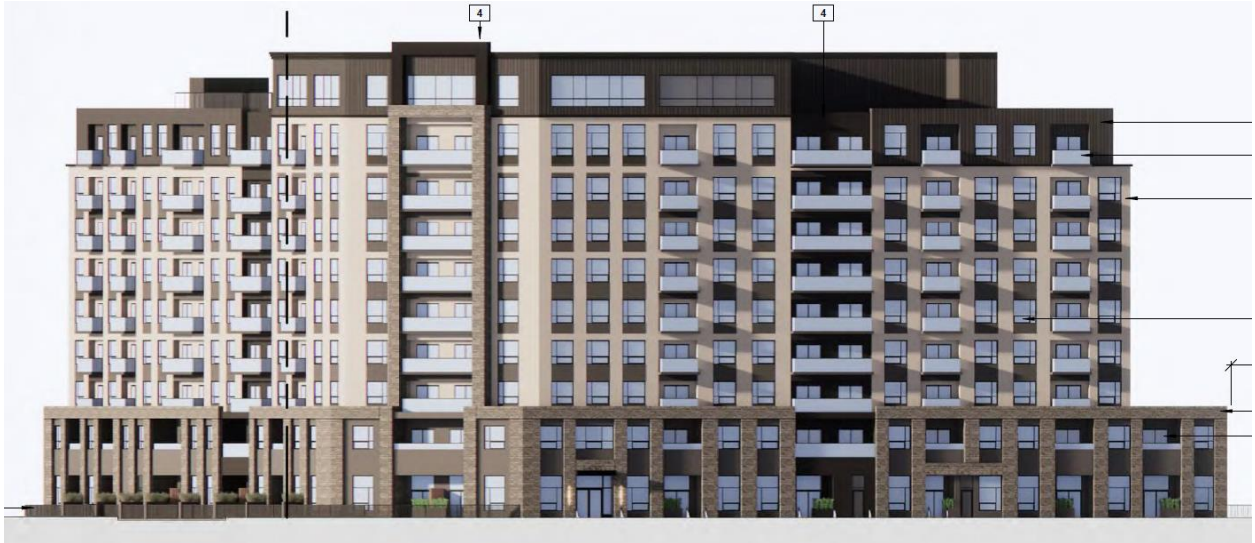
Rendering of the west building at 100 Villagewalk Boulevard showing the podium and patio/terrace design.
